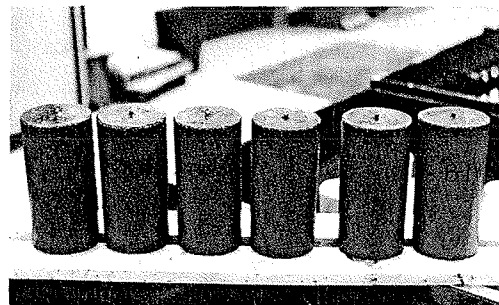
Condition of 4½-sack concrete after 4 cycles of alternate immersion in tap water and oven-drying.
